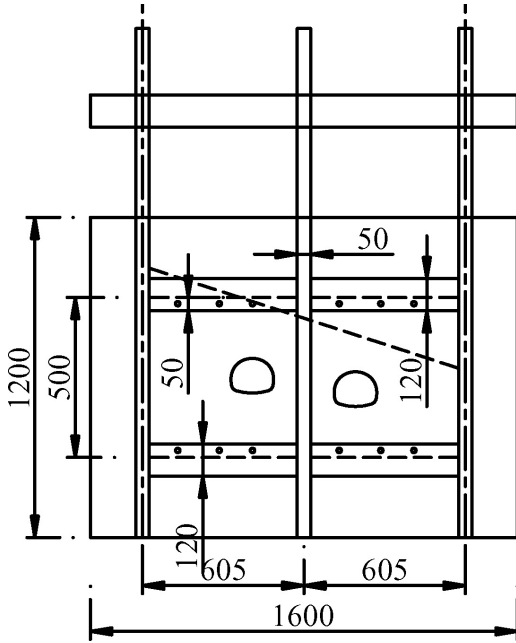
Sketch of steel frame with model tunnel (Unit: mm).
